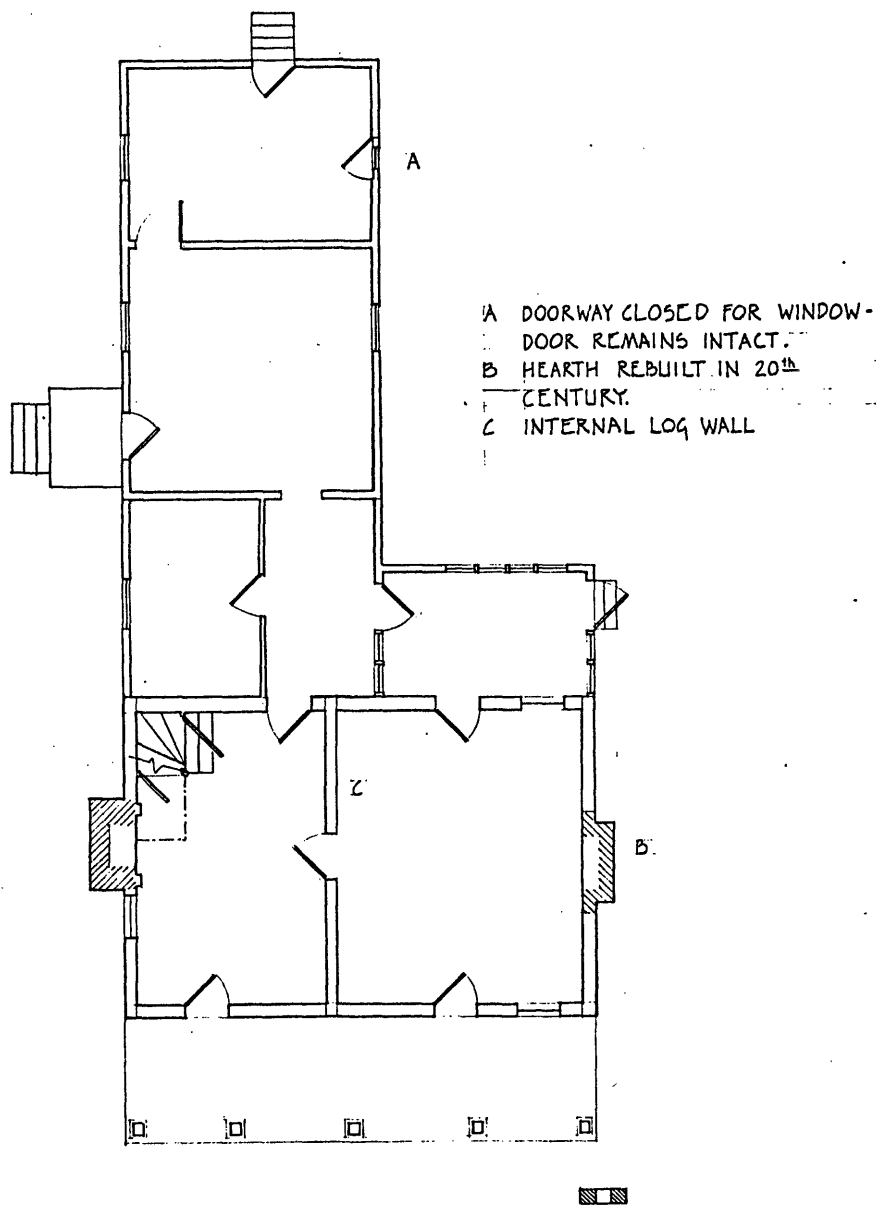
Floor plan of the George Stone House. Scale in Feet.
